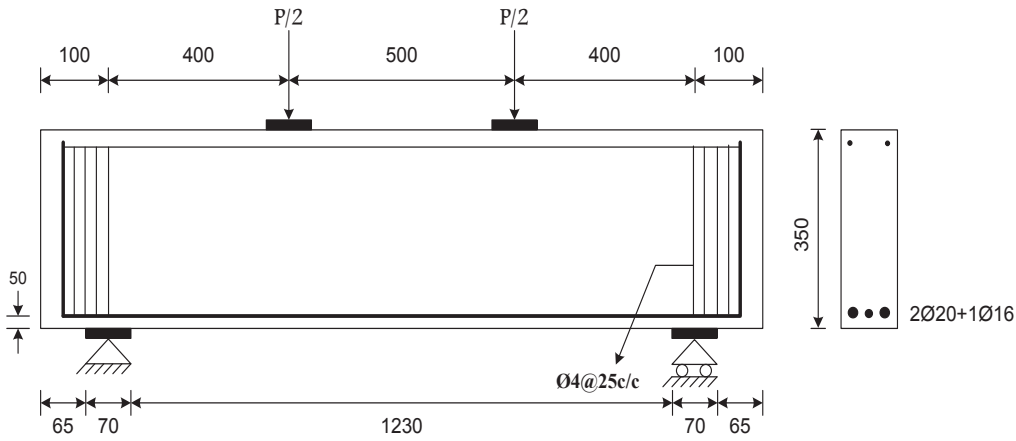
Details of Beams (B7, B8) (All Dimensions are in mm).
